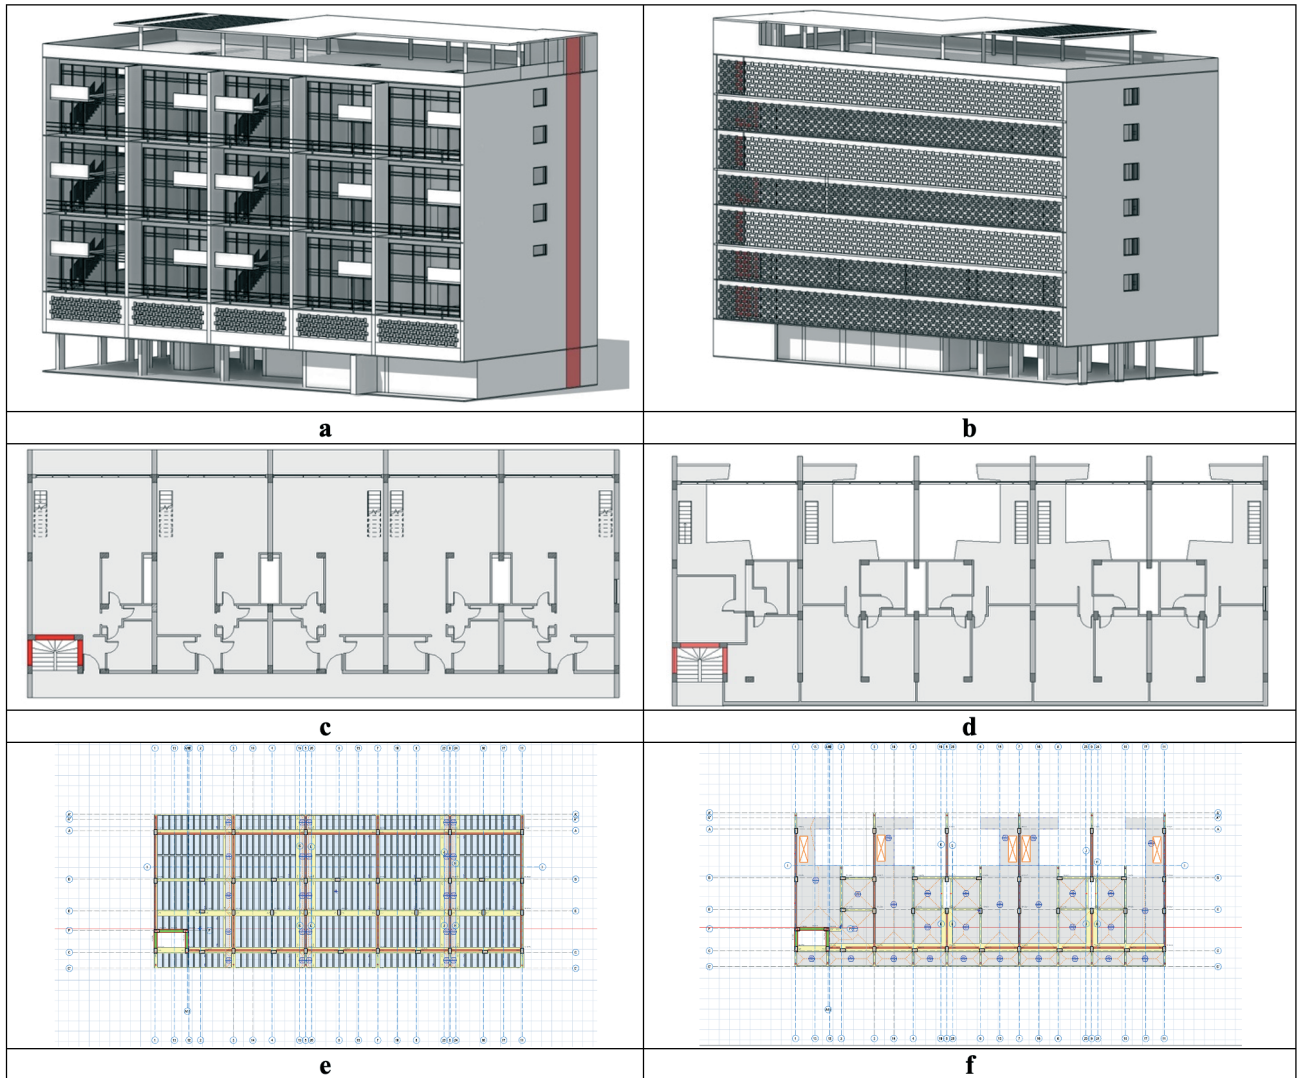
Model 3 – Shear walls around the stairwell: a. Perspective views from northwest façade. b. Perspective views form southeast façade. c. Residential unit's entrance floor plan. d. Residential unit's mezzanine floor plan. e. Residential unit's entrance floor ProtaStructure model. f. Residential unit's mezzanine floor ProtaStructure model (3-D images are produced by authors via Autodesk Revit Software; 2-D images are produced via ProtaStructure Software).
